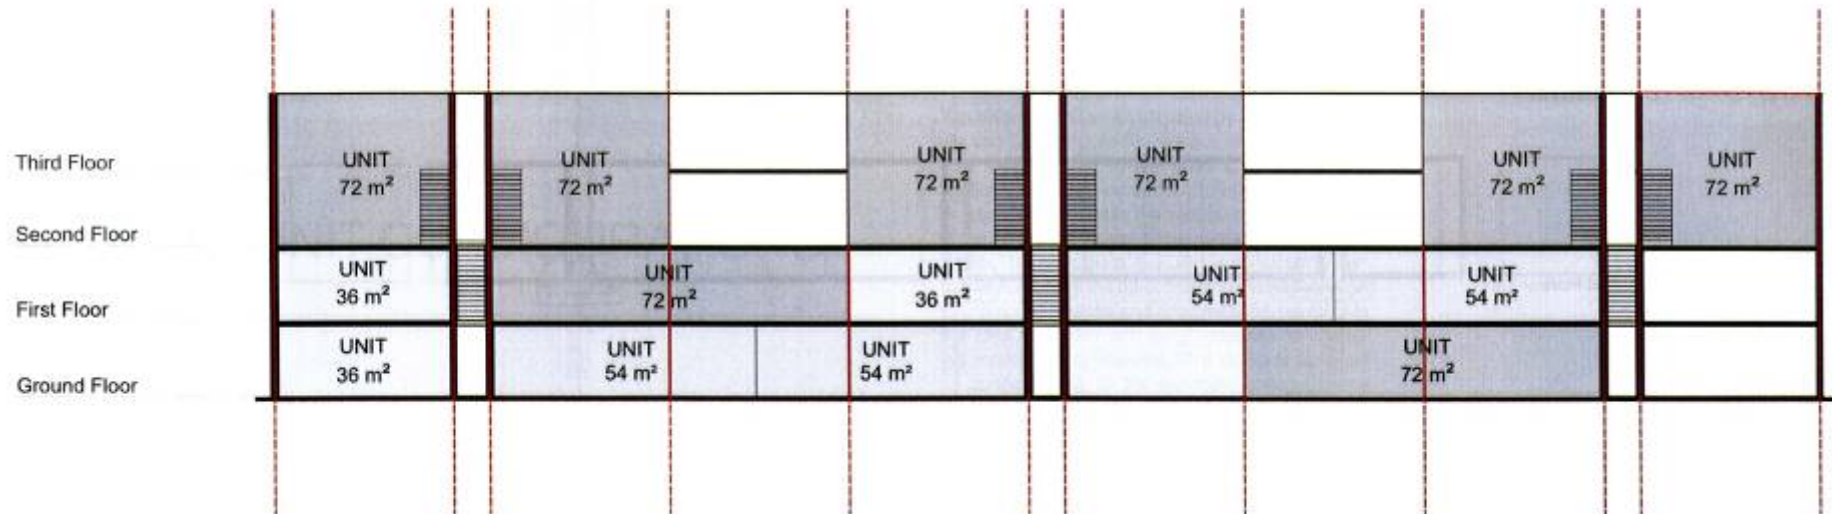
Floor Configuration of Four Storey Walk-up: Sectional Elevation
